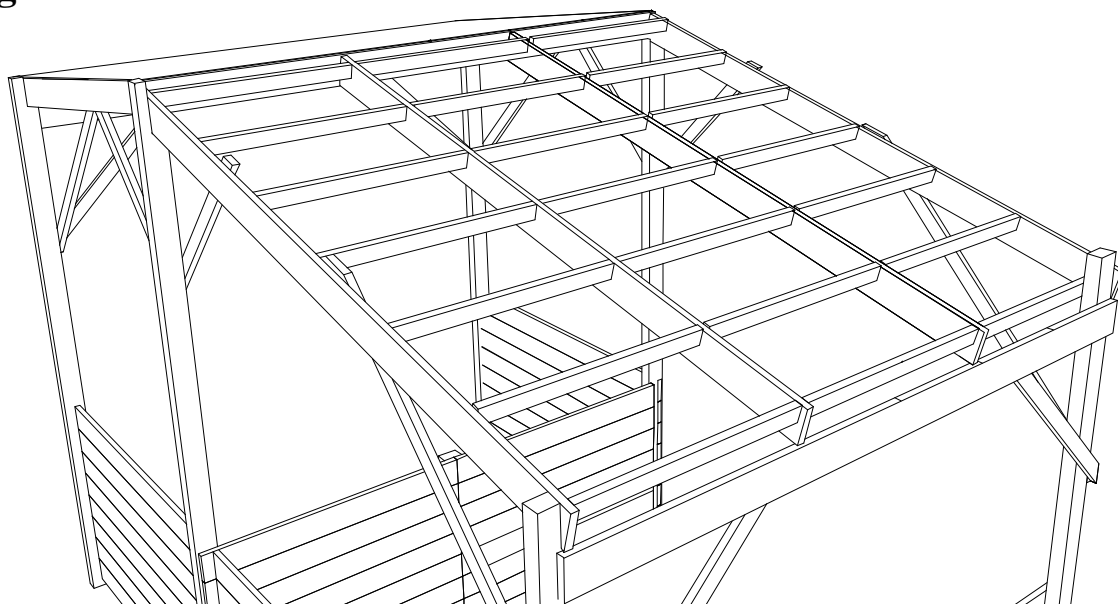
For roof purlins recessed and turned edgewise, toenailing or hangers are acceptable ways of fastening purlins to rafters. 2x4 purlins may also be nailed on top of the rafters with one 60-d nail or attached with metal clips at each rafter. Rafters may be spaced up to twelve feet, dependent on purlin size, when purlins are turned edgewise. See purlin chart on page 3-9.
